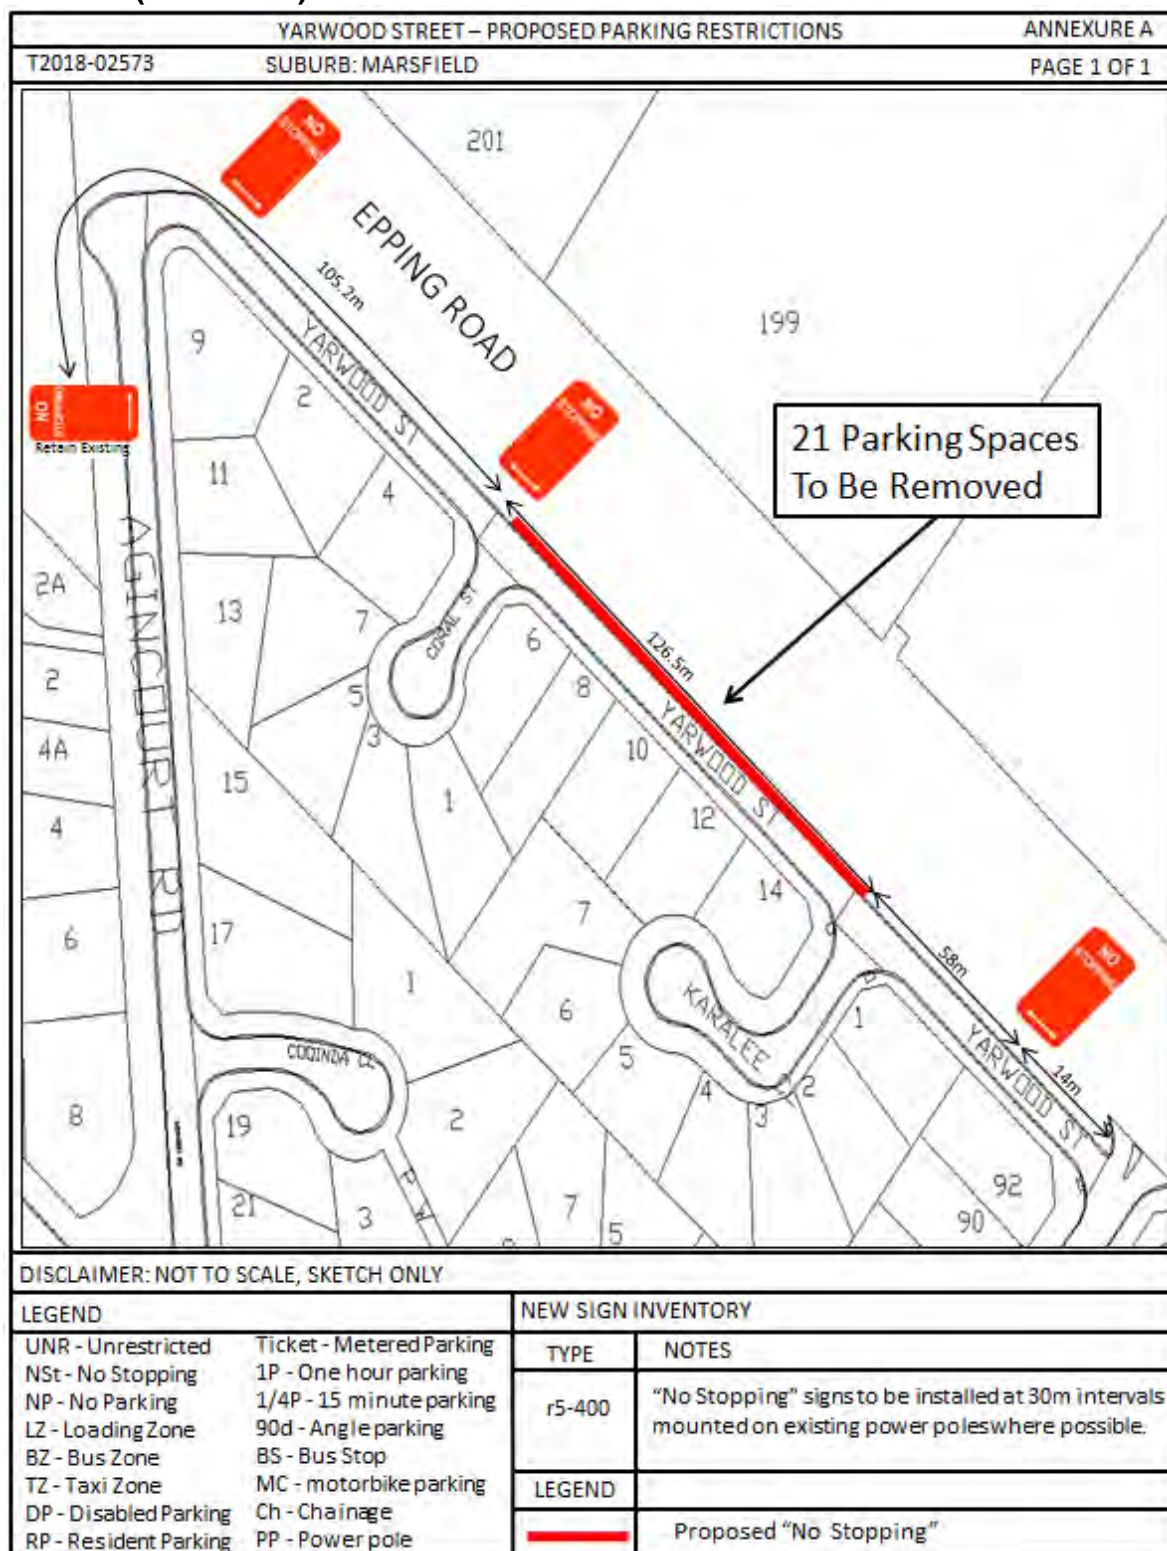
Proposed "No Stopping" on the northern side of Yarwood Street, between Karalee Close and Coral Street
